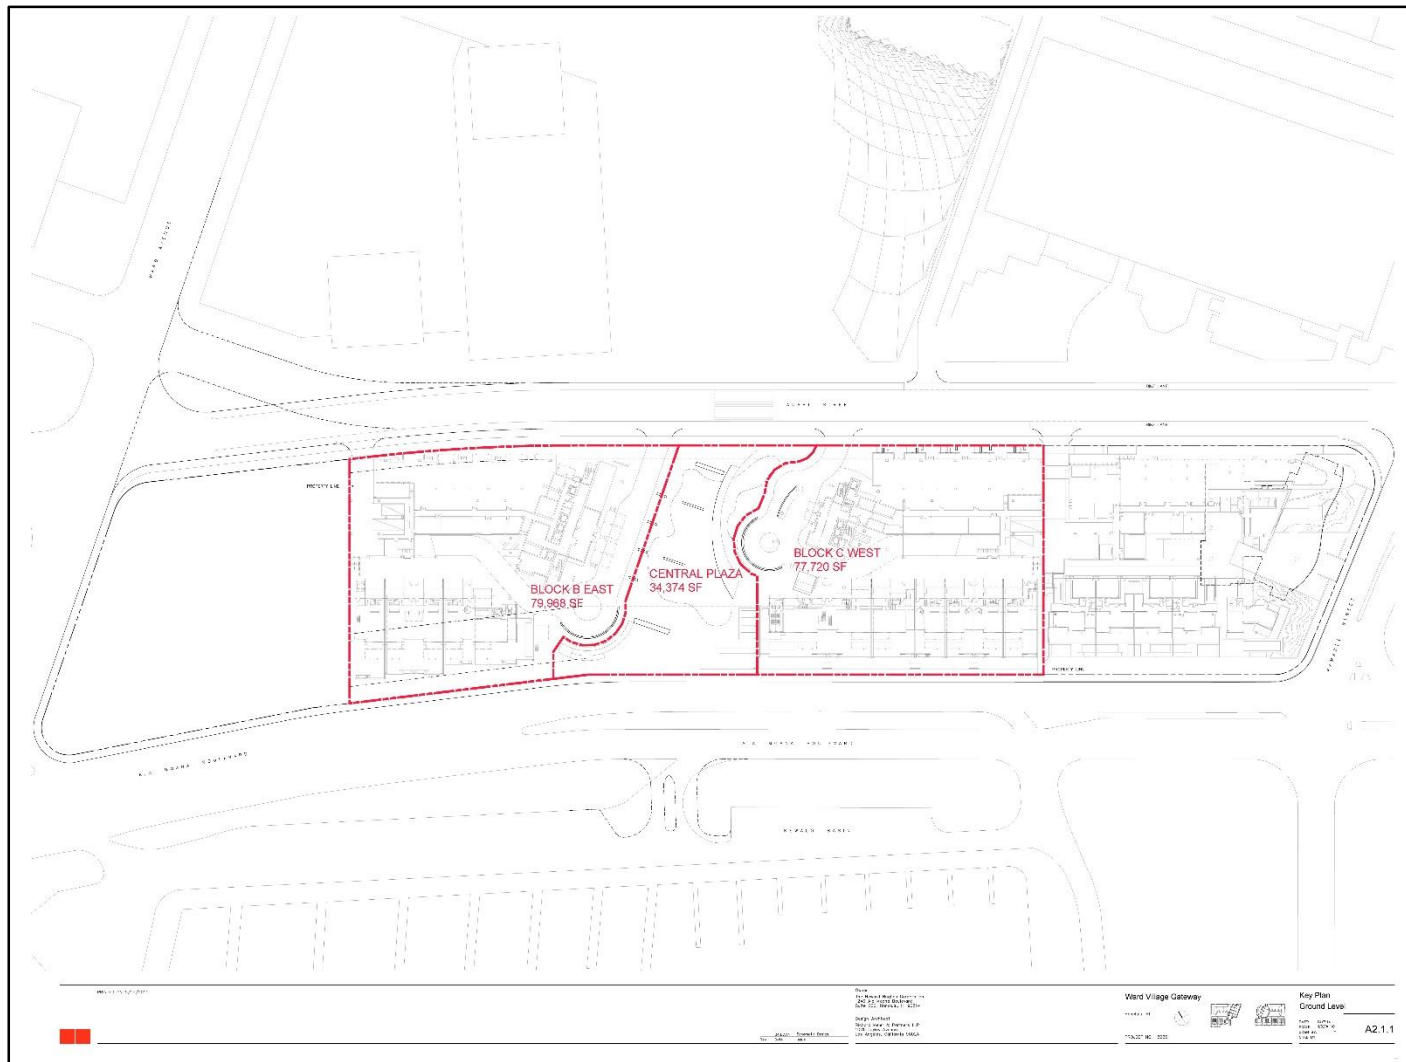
Project design showing the Ward Village Gateway building complex, straddling the Block B East and Block C West project areas, consisting of low-rise villas, residential towers, and commercial retail shops separated by a central plaza
